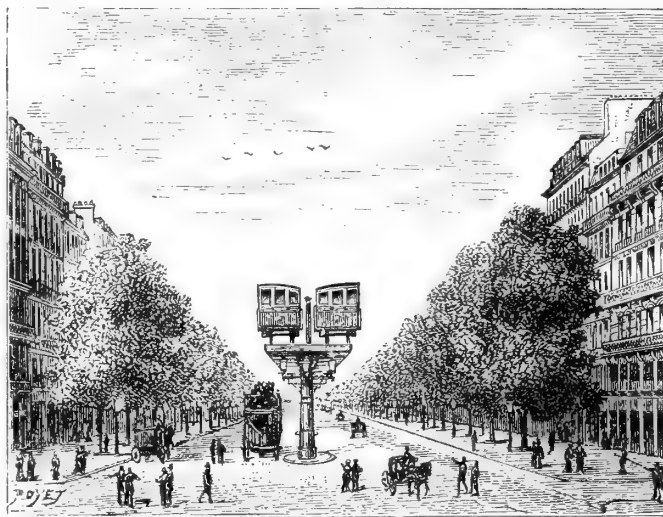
SECTION OF THE PROPOSED ROAD.
